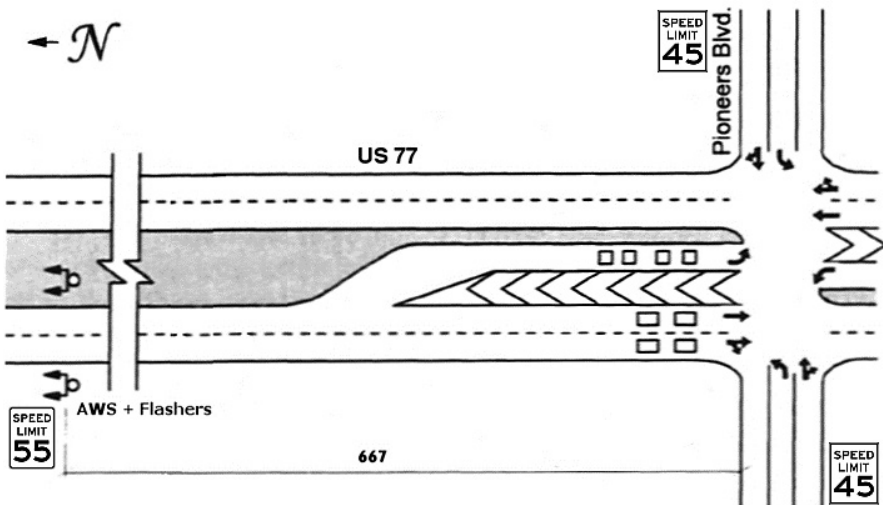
Study site – US-77 & Pioneers Blvd in Lincoln, NE
